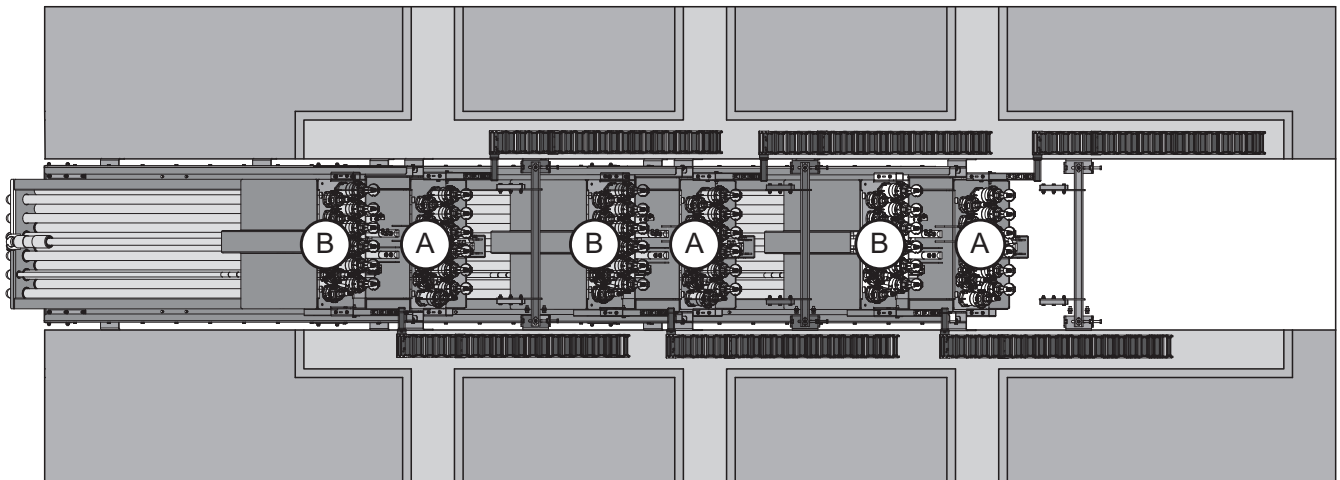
Cable Track Installation on Both Sides of UV Channel - Method A
